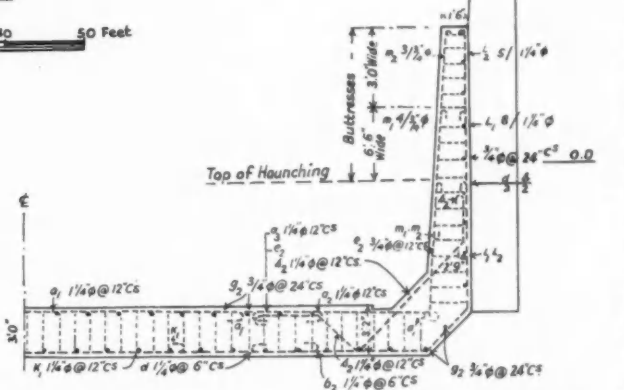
SECTION THRO. FLOOR & BUTTRESS.
